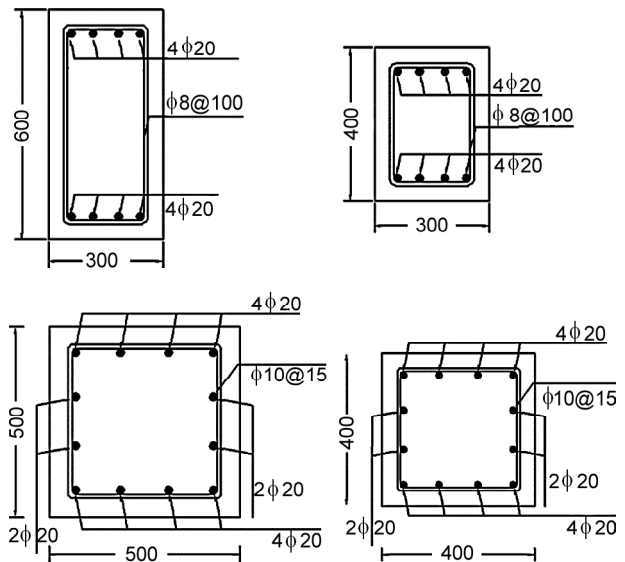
Member cross sections (dimensions in mm, @ is used between stirrup size and spacing).
